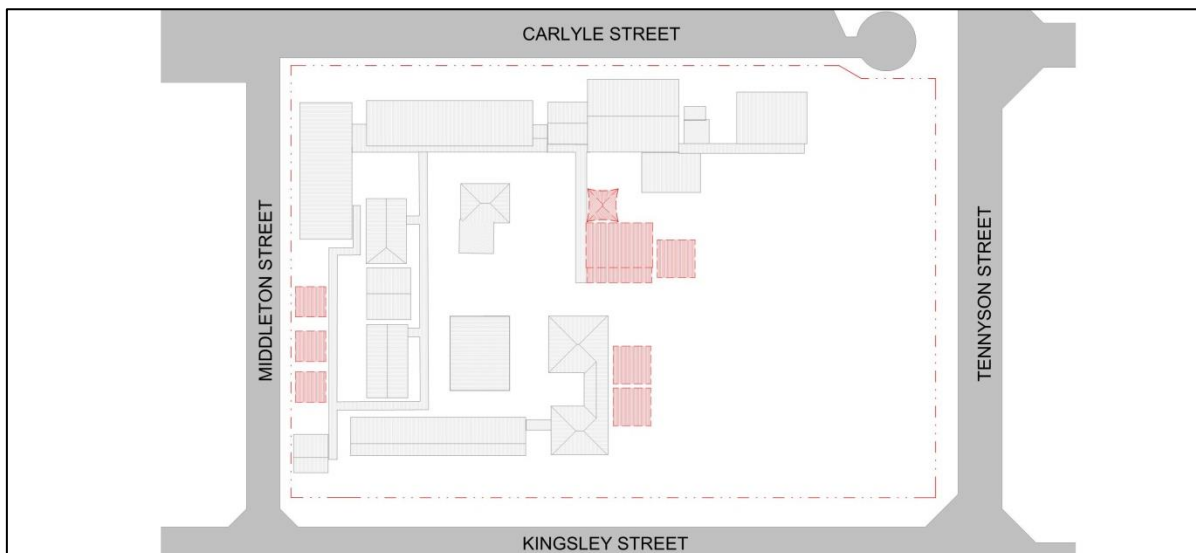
Demolition plan of the School. (Source: Conrad Gargett)
